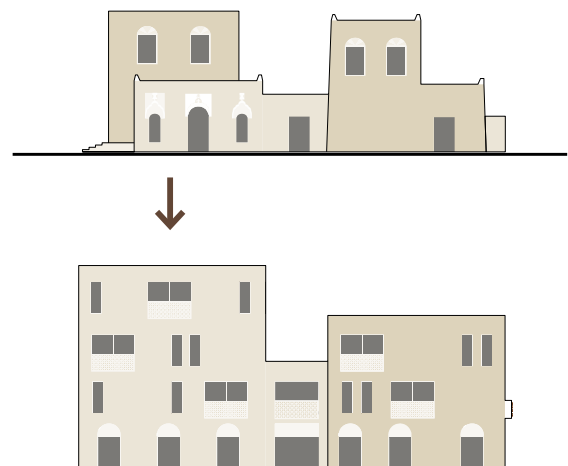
Adaptation of traditional architectural elements to a contemporary building
